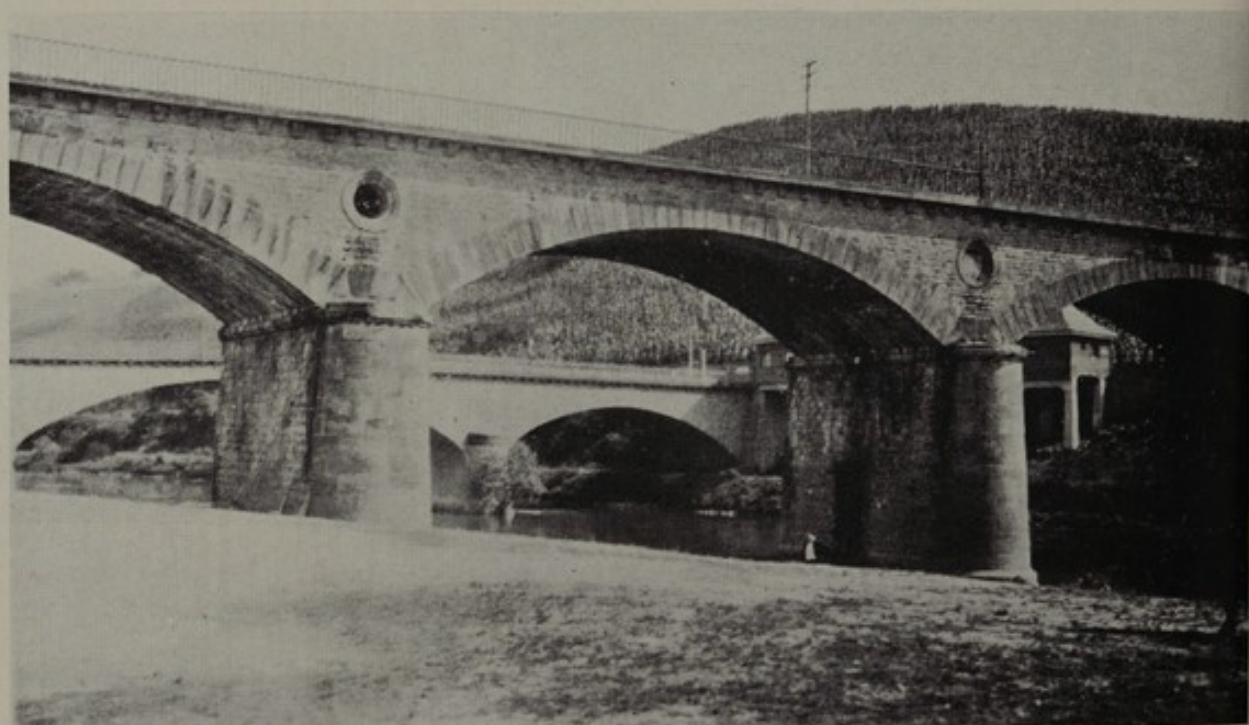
THE ROAD AND RAILWAY BRIDGES AT WASSERBILLIG
